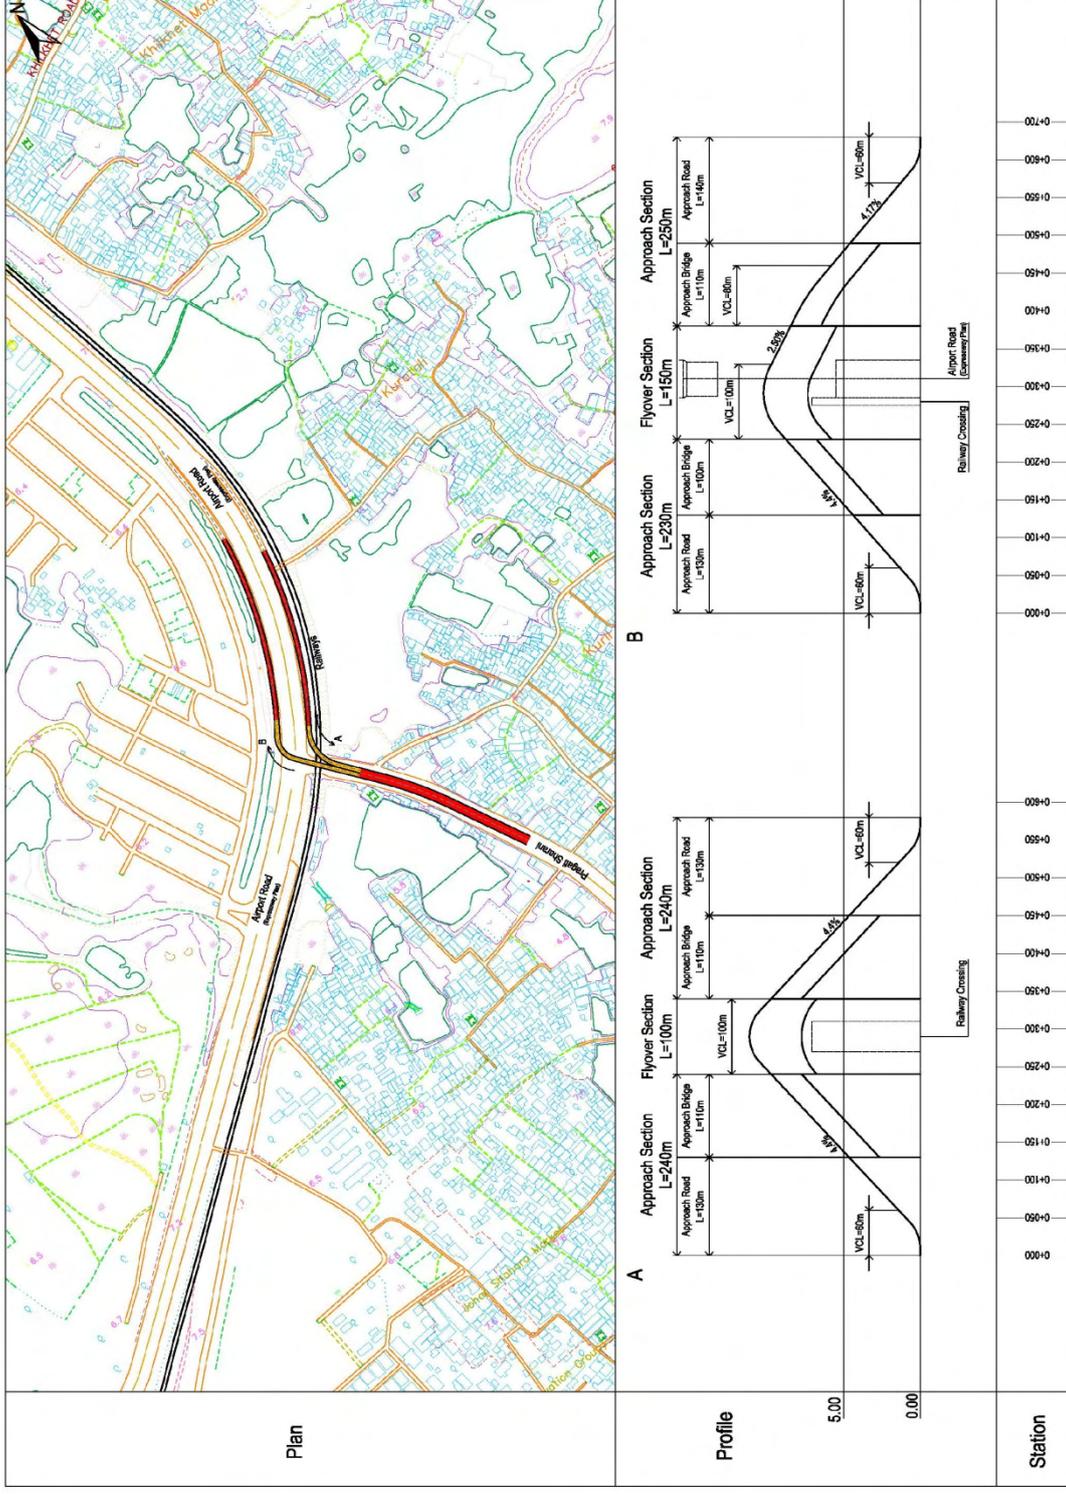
Layout Plan and Profile of Kuril Flyover Plan
